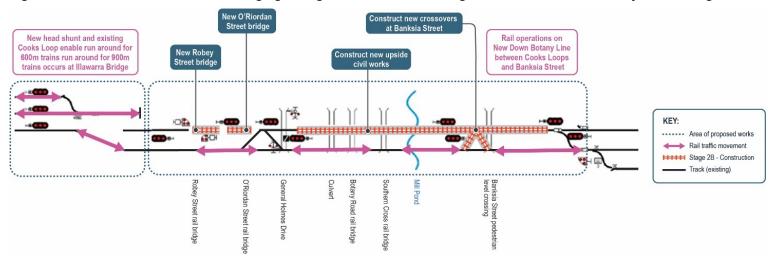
Indicative construction staging – Stage 2B: Construct new O'Riordan Street and Robey Street bridges
